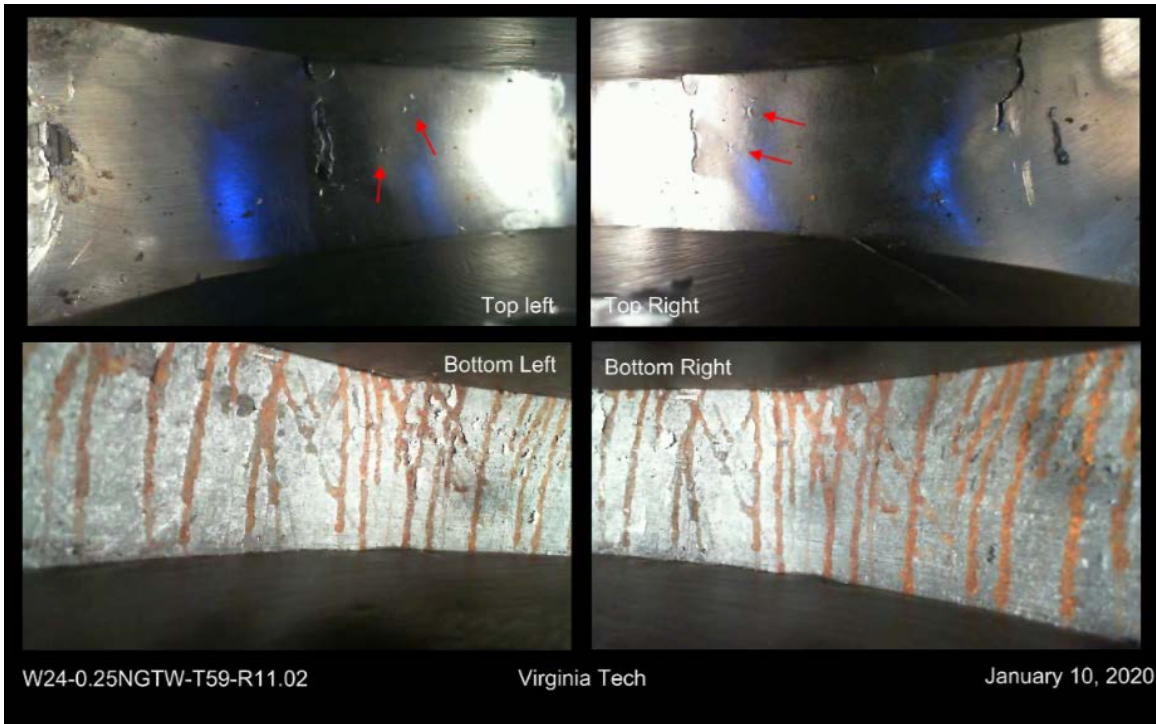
Fracture initiation of W24-0.25NGTW-T59-R11.01.
